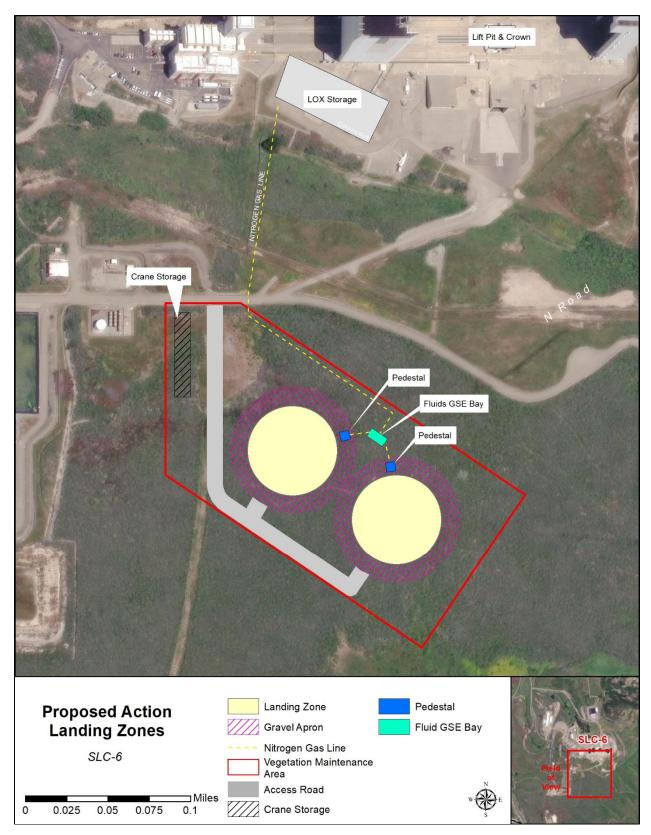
Conceptual site layout for construction of new landing zones.
